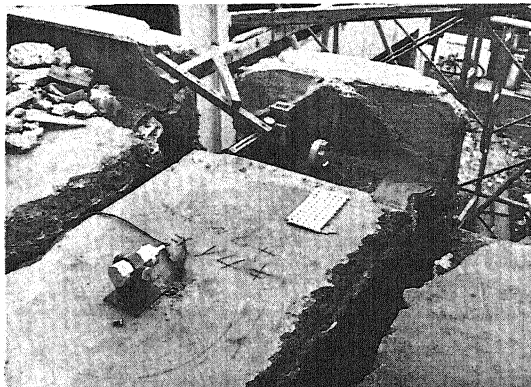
Shear Cracks in 2nd Storey Interior Column (Maibara).
